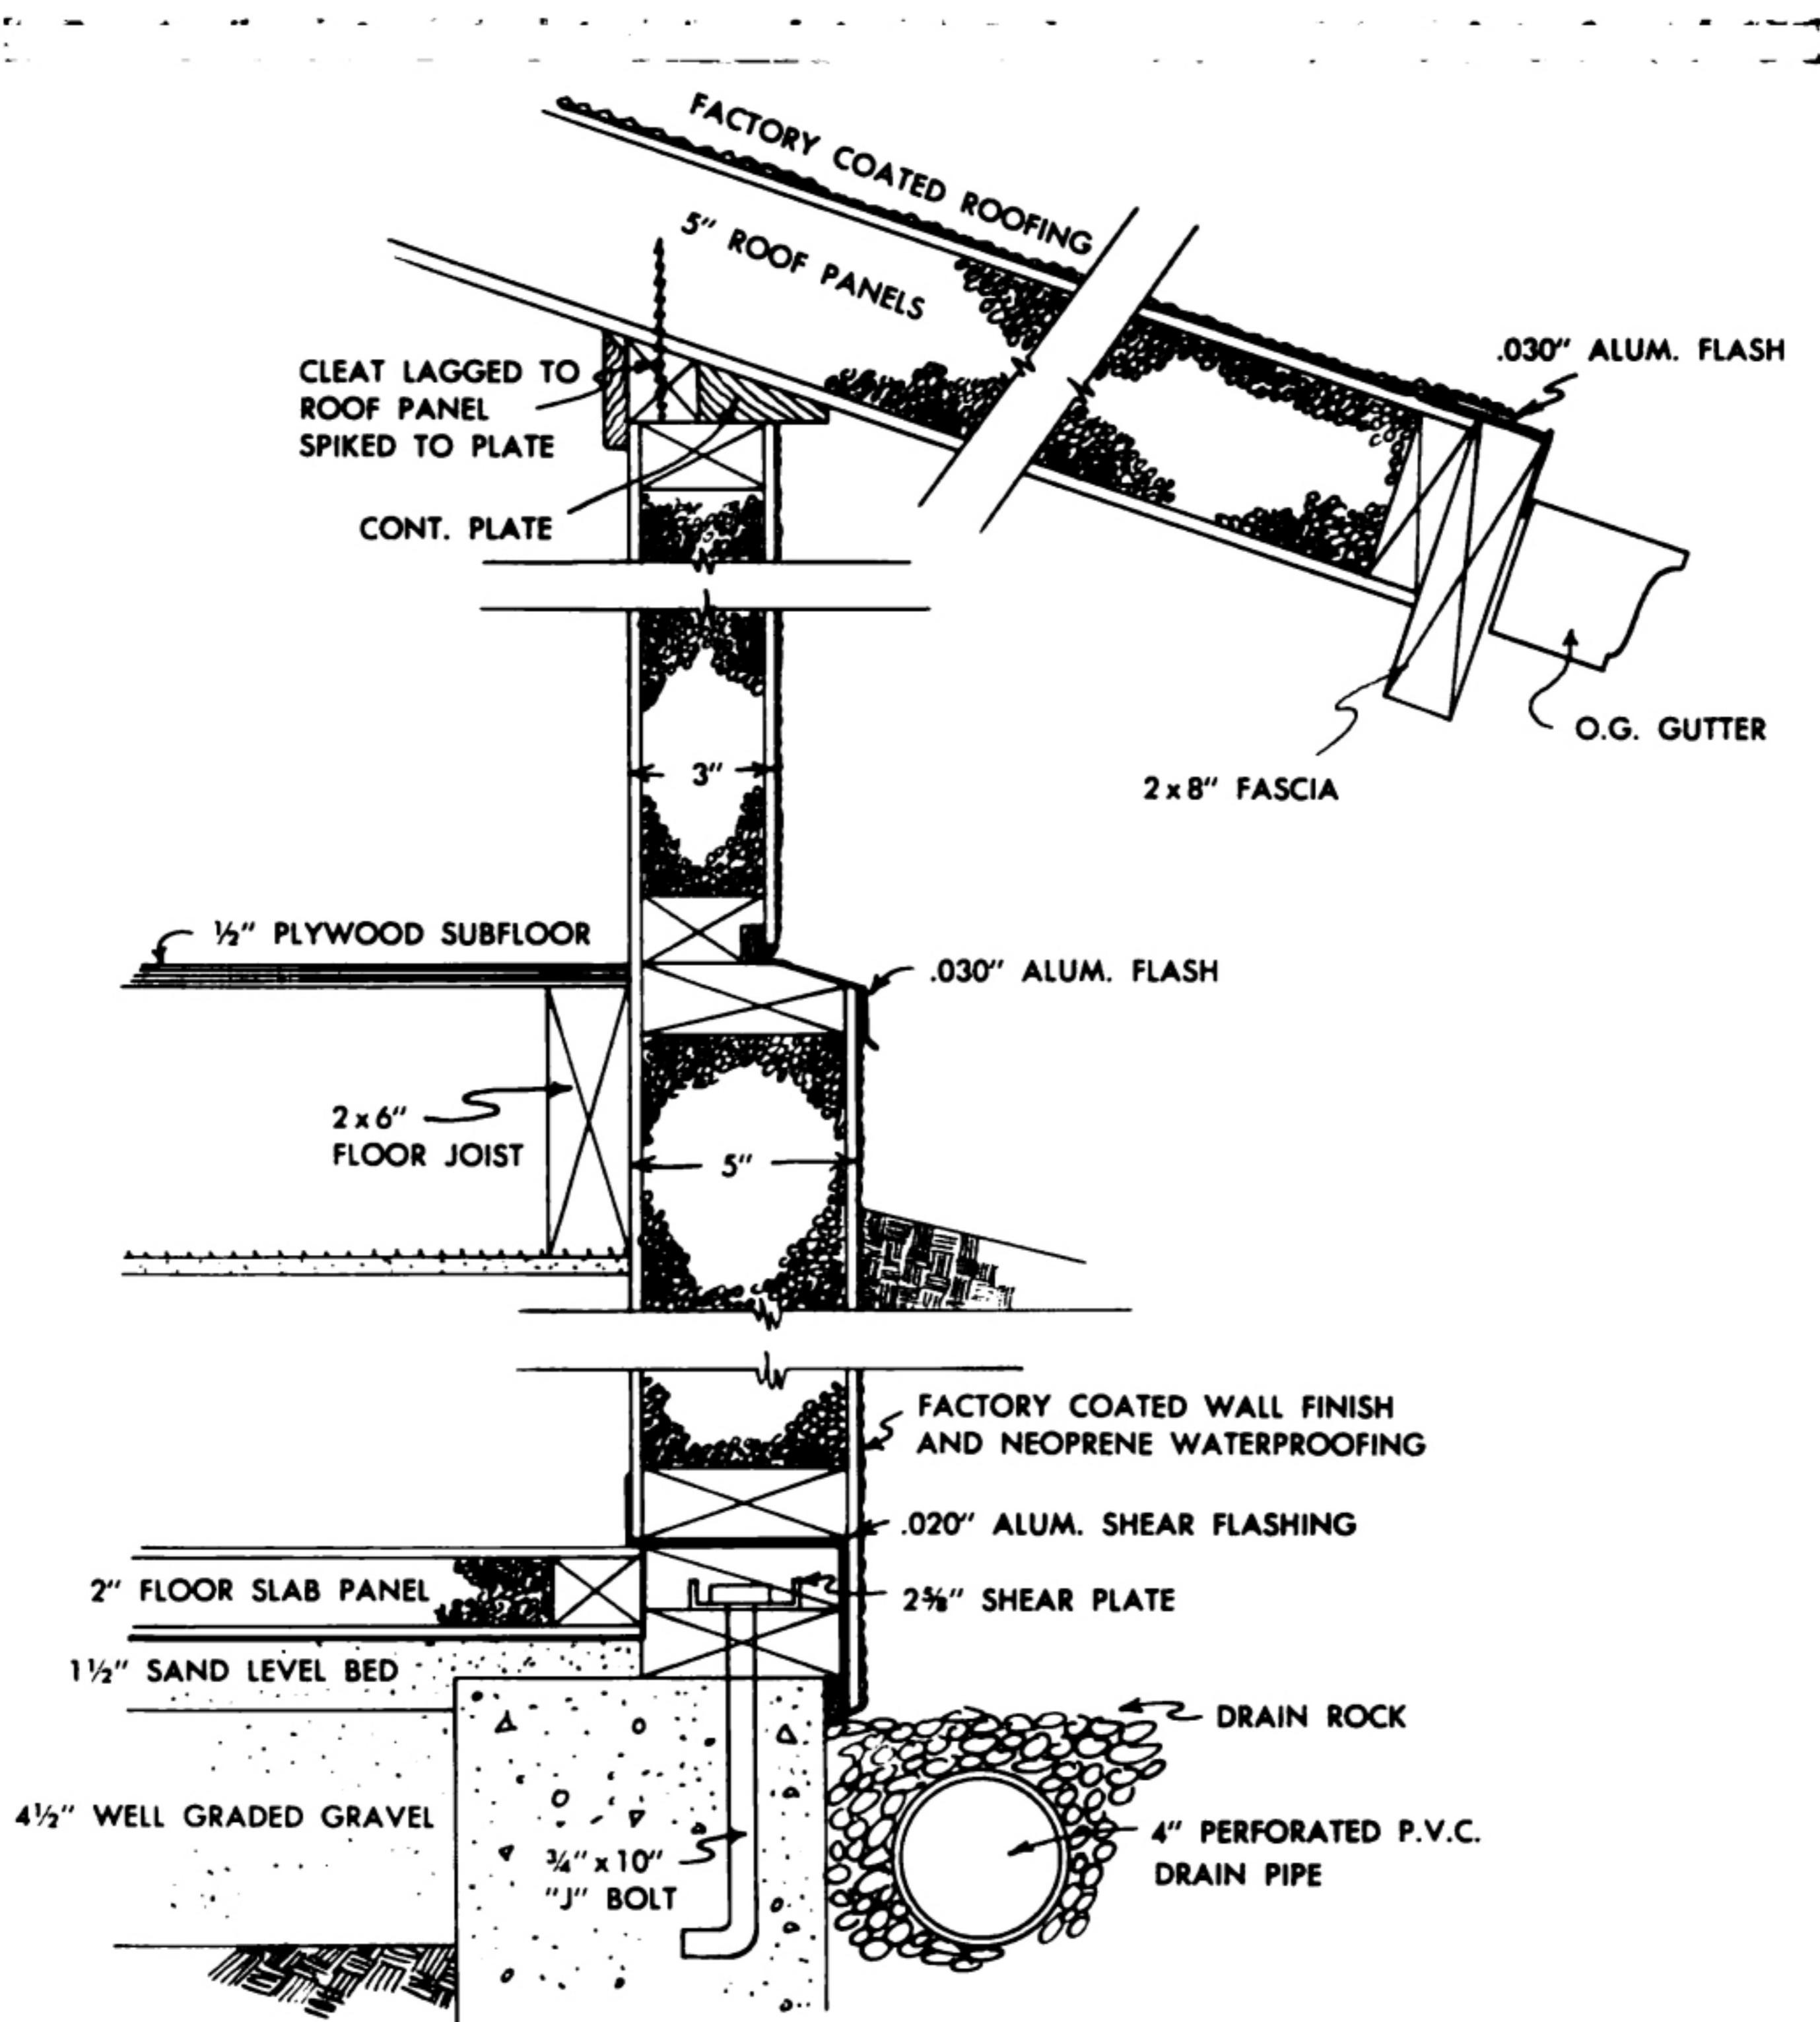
Section through rear retaining wall, floor slab, second floor and roof
